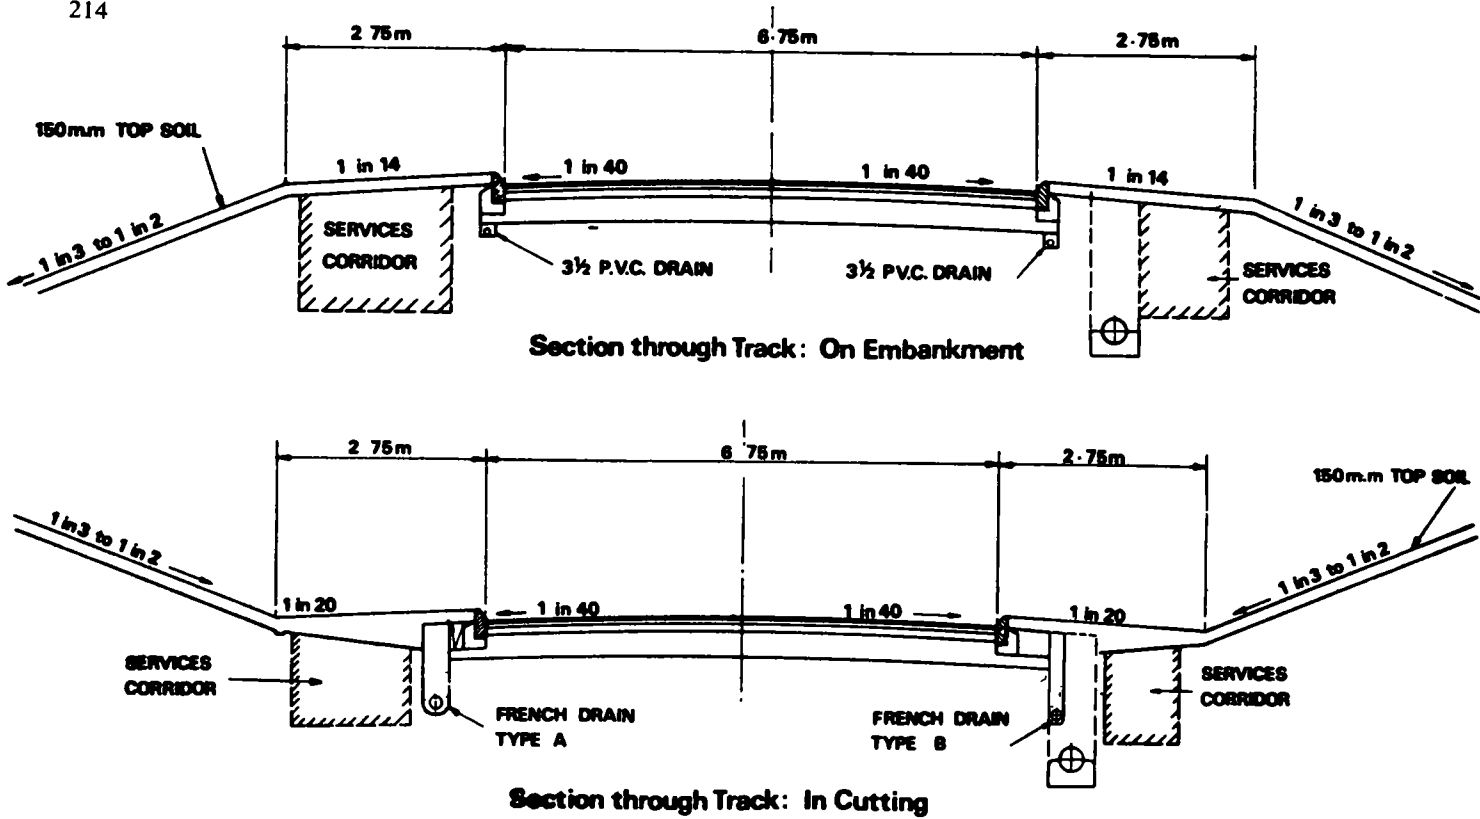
Typical cross sections, "figure-8" busway, Runcorn, England.
